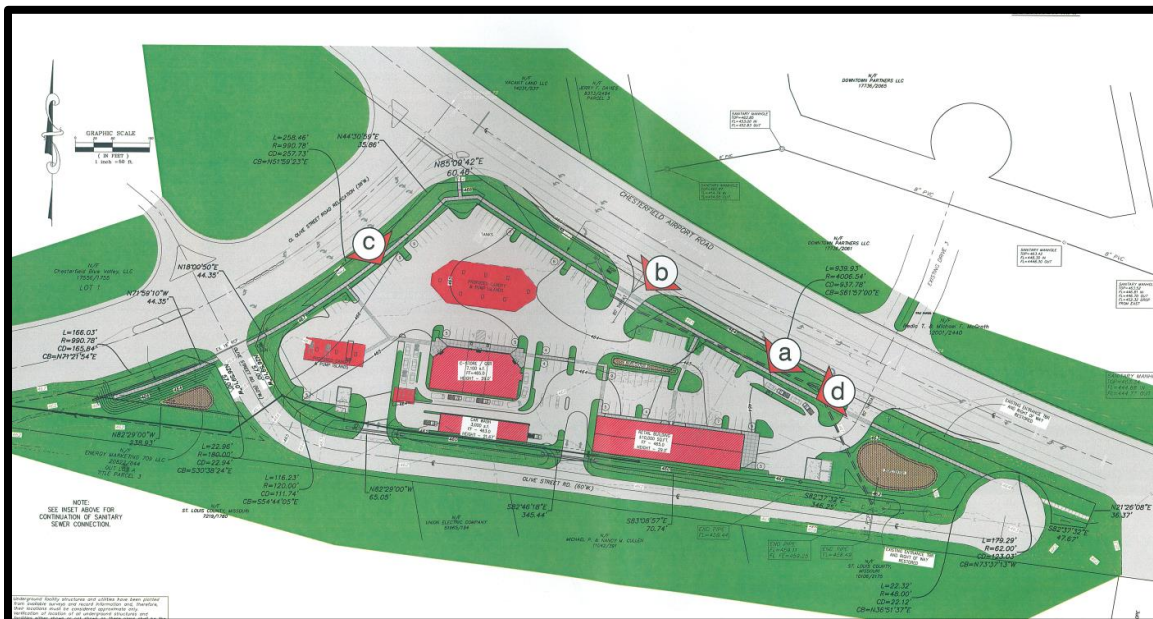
Colored Site Plan (letters represent cross section details not shown)
